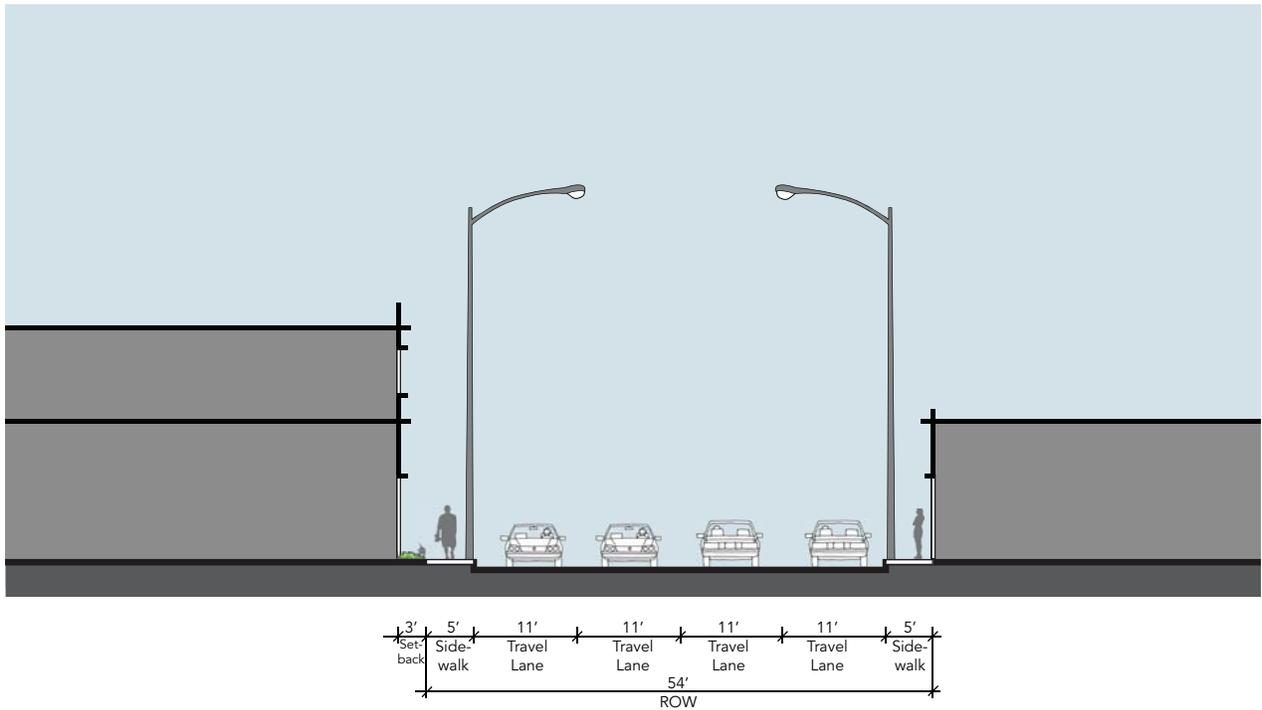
Existing Conditions (San Bruno Avenue facing west between San Mateo Avenue and US 101)
